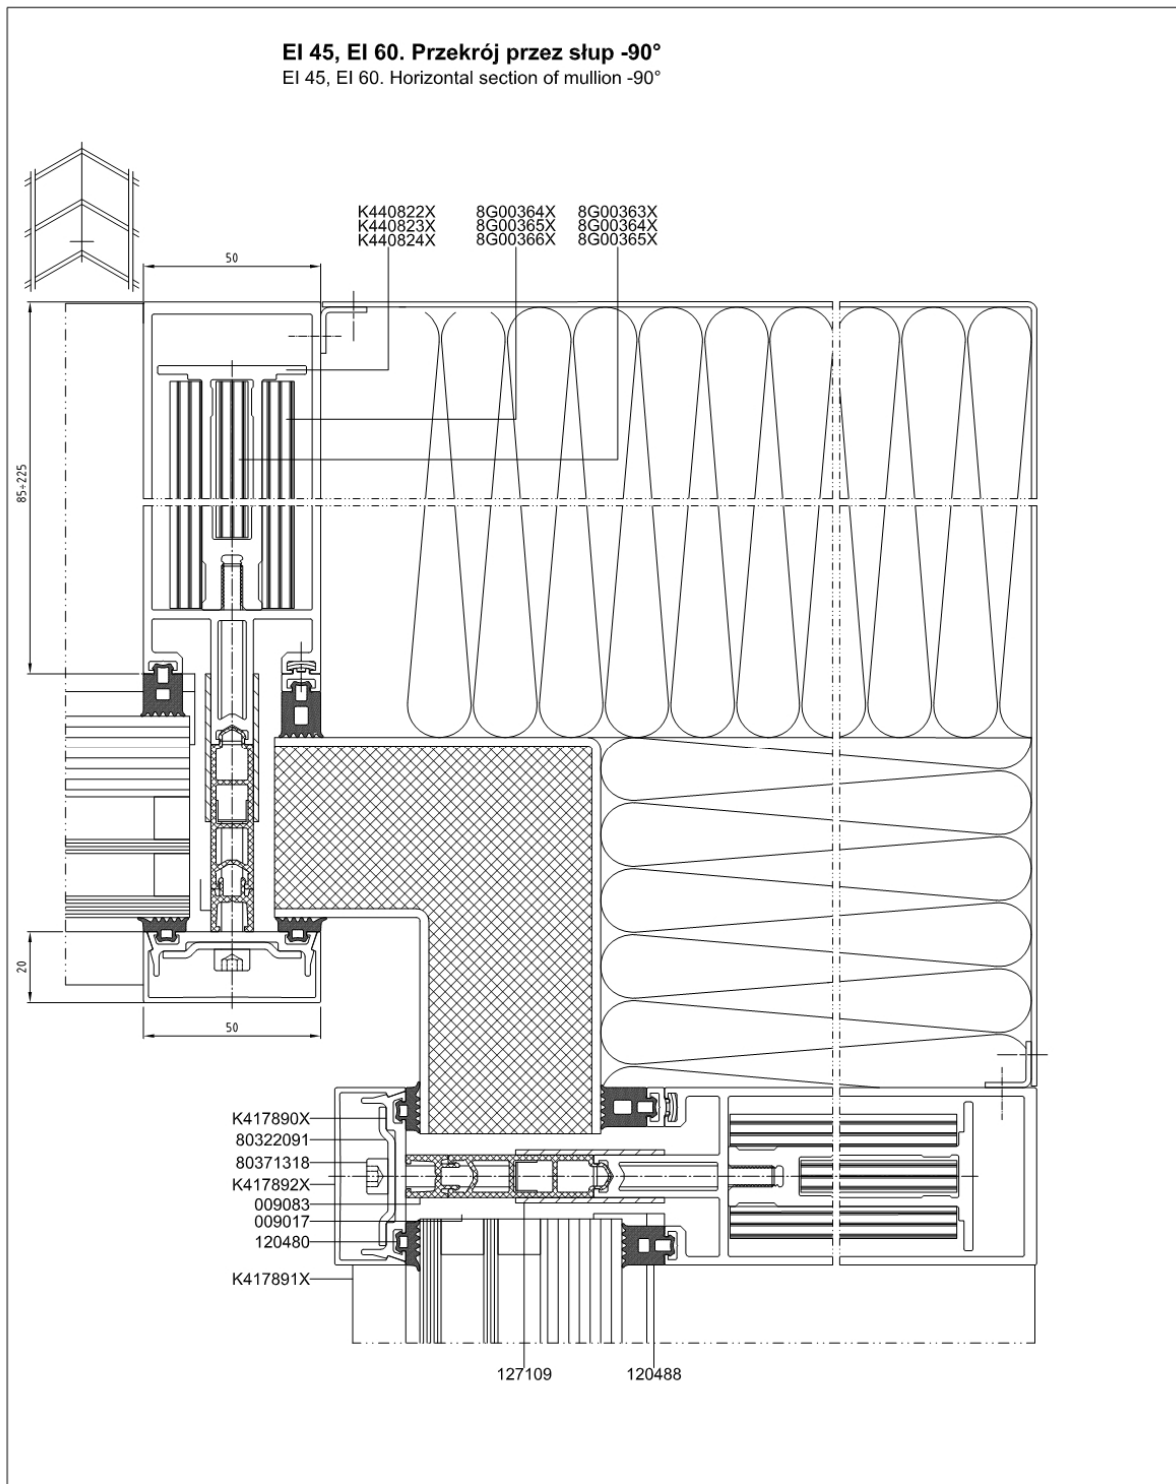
Typical cross-section through the corner of MB-SR50N EI EI60 system curtain wall
